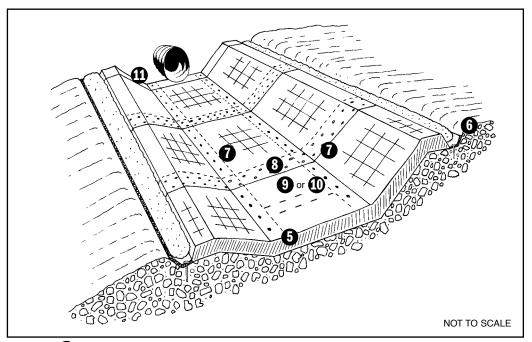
Installation of TRMs & HPTRMs in storm water channels
